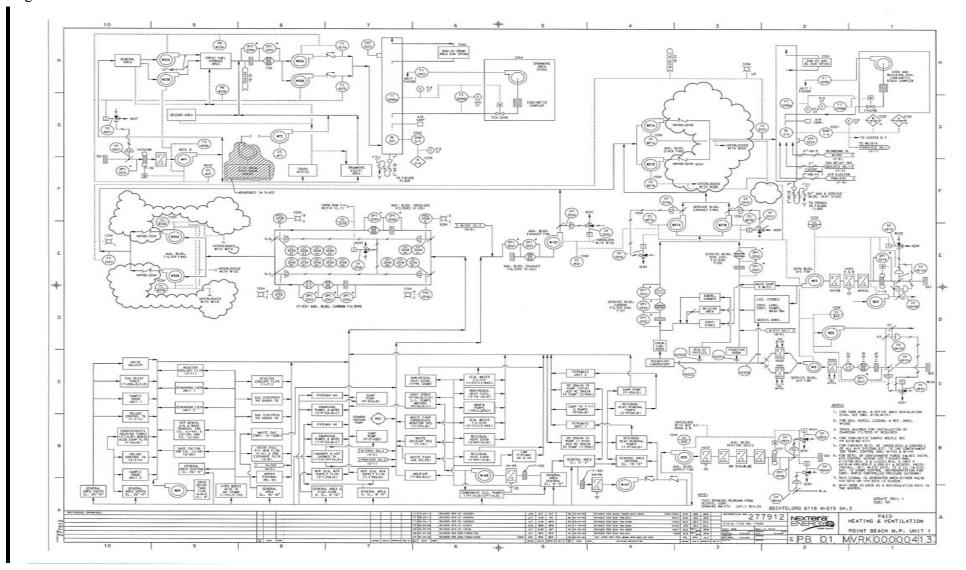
PIPING & INSTRUMENT DIAGRAM HEATING & VENTILATION AIRFLOW
